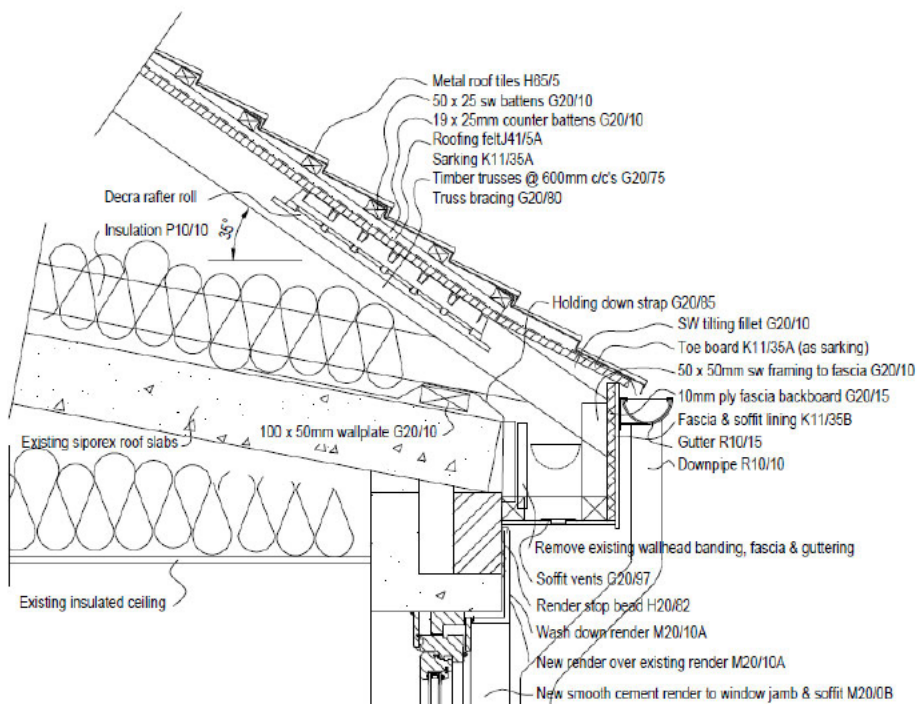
Section detail through eaves of refurbished 'flat' roof system (upper)
